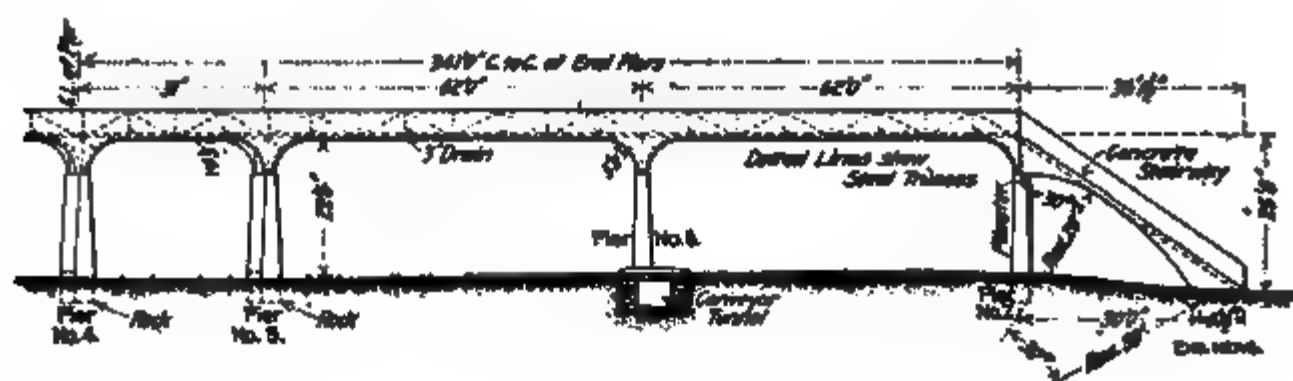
STEEL CONCRETE FOOT VIADUCT, ELEVATION.
